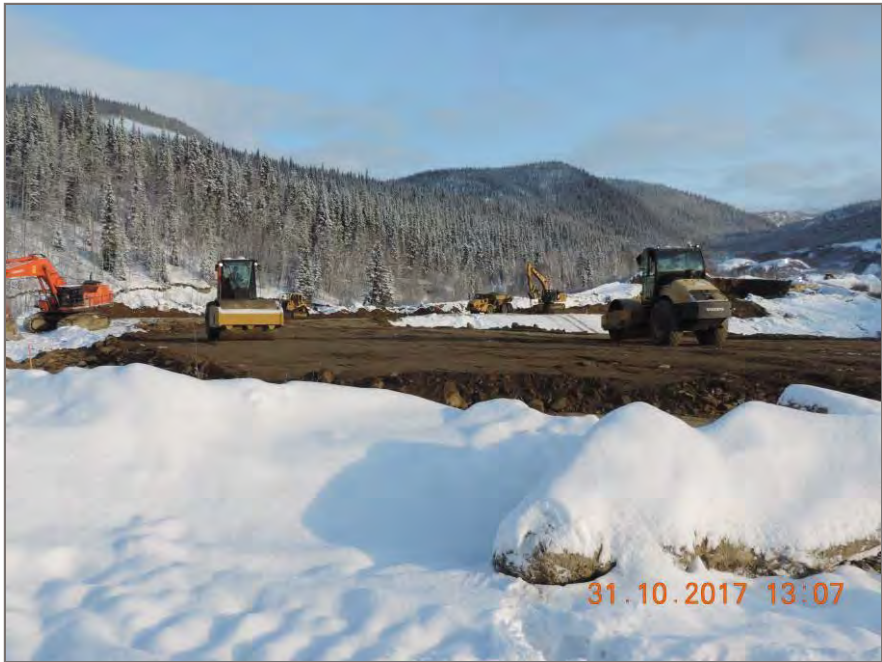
Packing on grade. Packers using Static packing. Elevation 811.9
